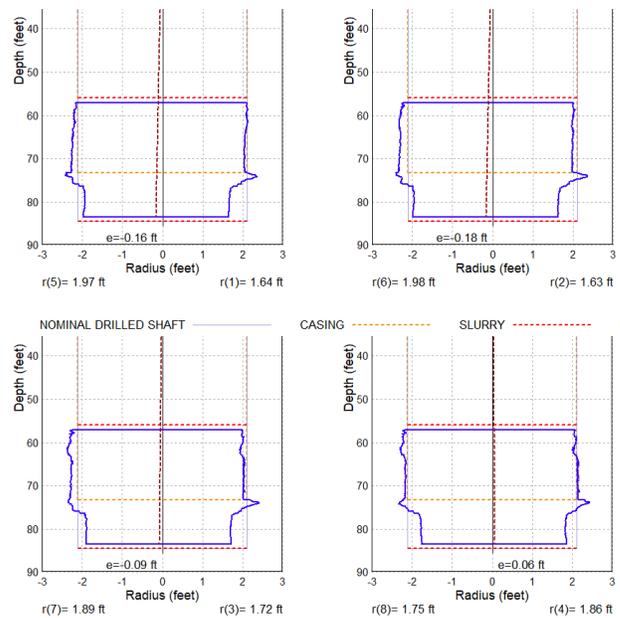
SHAPE test results from shaft with caving soil below casing.
